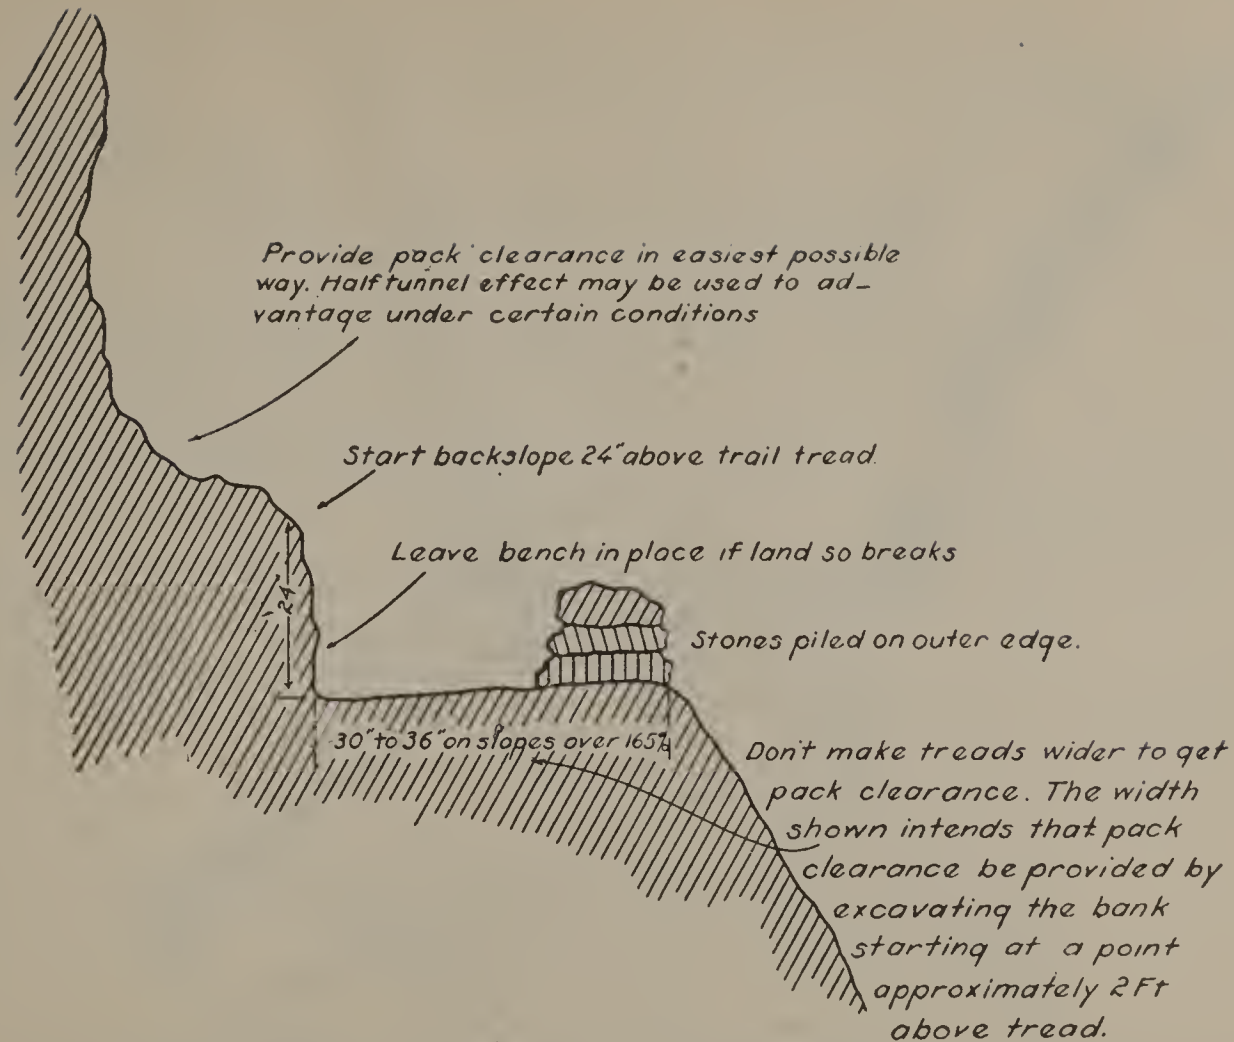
Trail construction on steep hard slopes and around bluffs. (Par. 66.)
